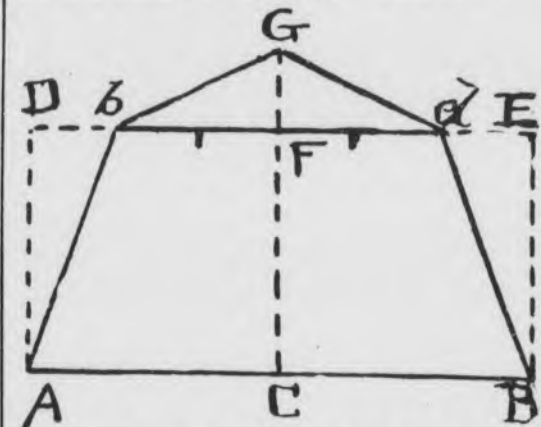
LAYOUT OF A TRUE MANSARD ROOF.
